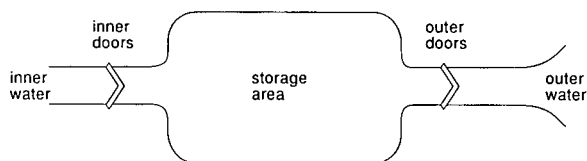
Plan view of a storage reservoir, which is also used to flush the outer channel
